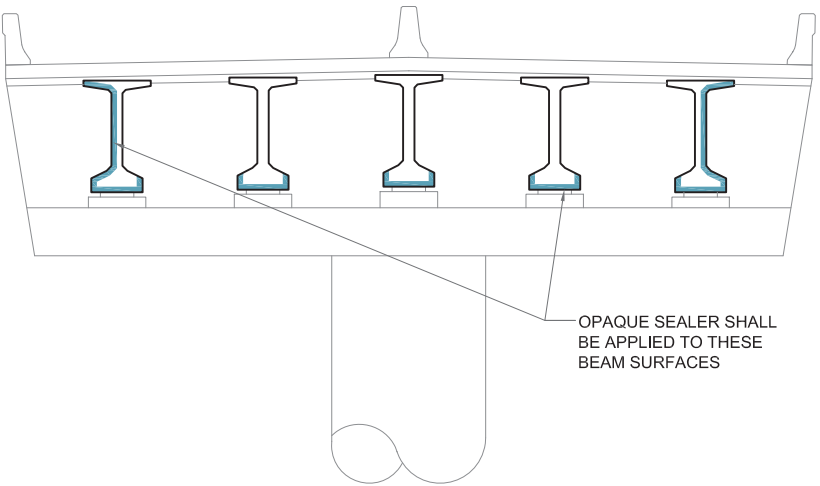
Required surfaces for aesthetic treatment on concrete beams
